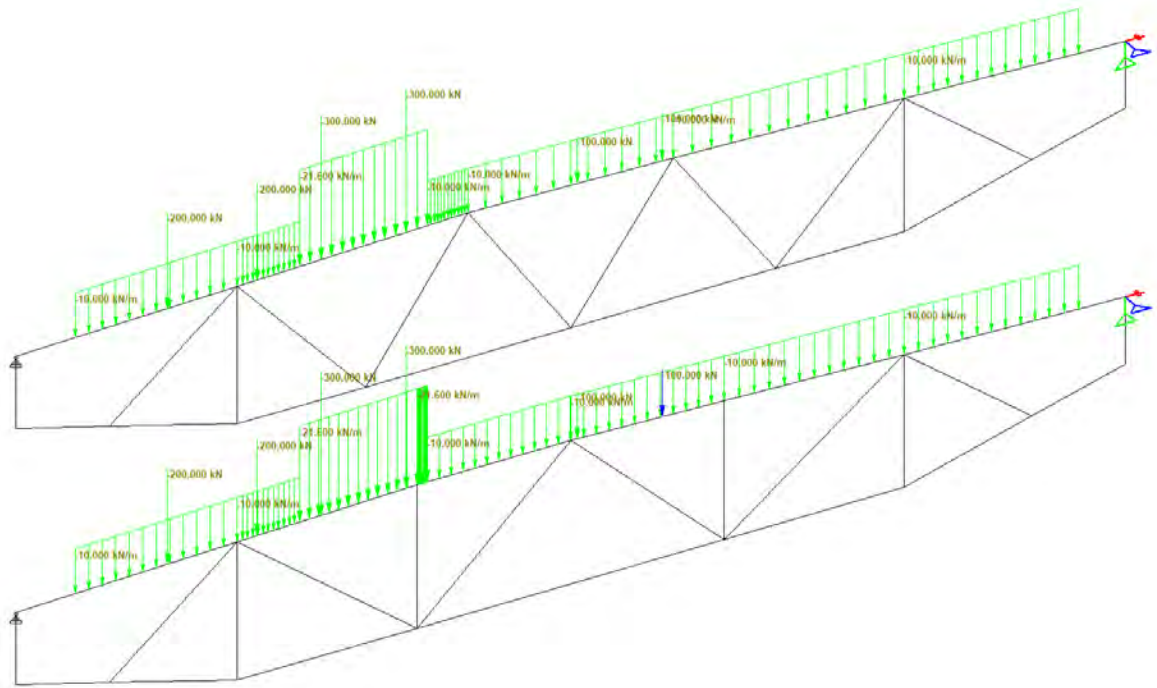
Traffic loads on bridge girder with maximum traffic in lane 2
